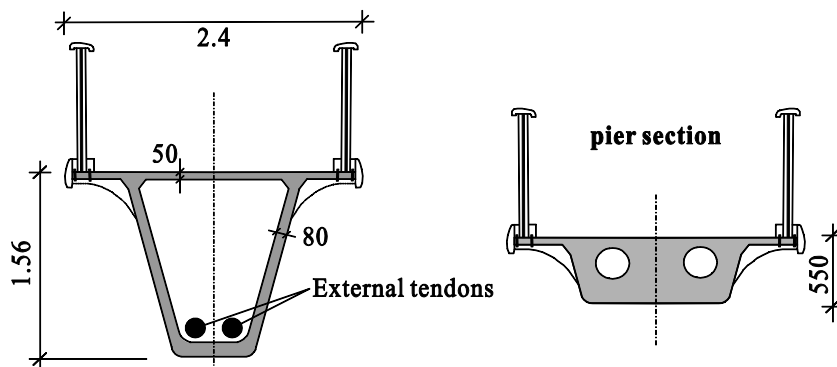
Cross-section of Sakata Mirai footbridge (left: mid-span section, right: at the pier), Japan, 2002 [Acker 2004]
